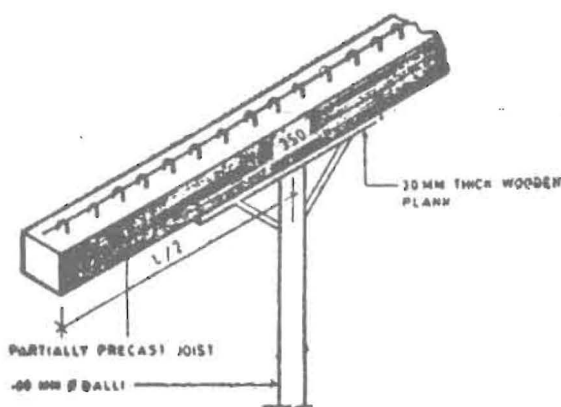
PROPPING OF PARTIALLY PRECAST JOIST
